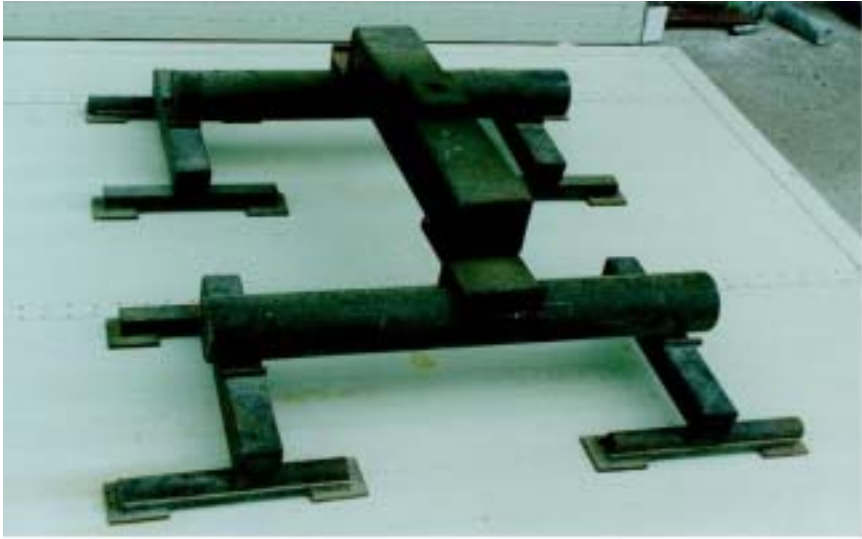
Load distribution arrangement for floor(1 Set)
